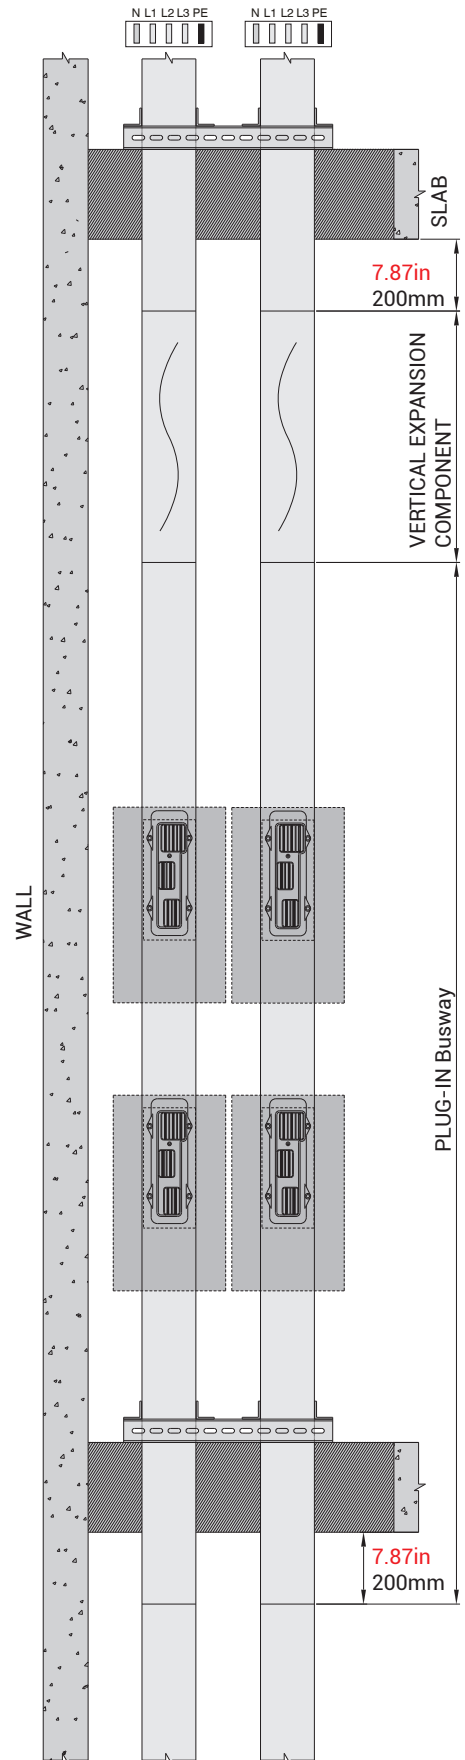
MINIMUM DIMENSIONS BETWEEN 2 RISERS
